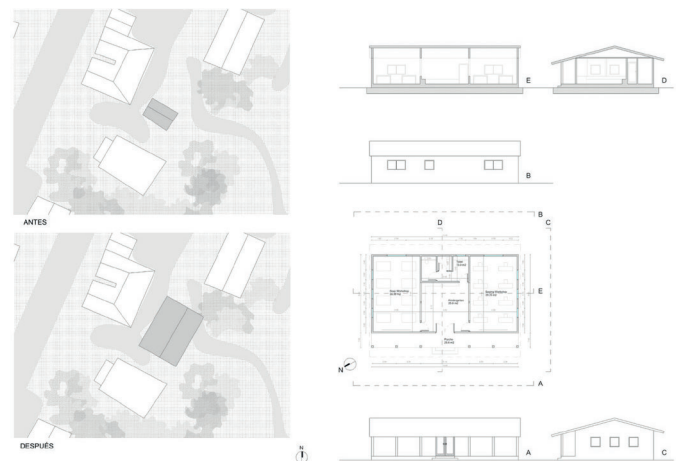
Floor plan of the location and proposal for the Mother Workshop.
